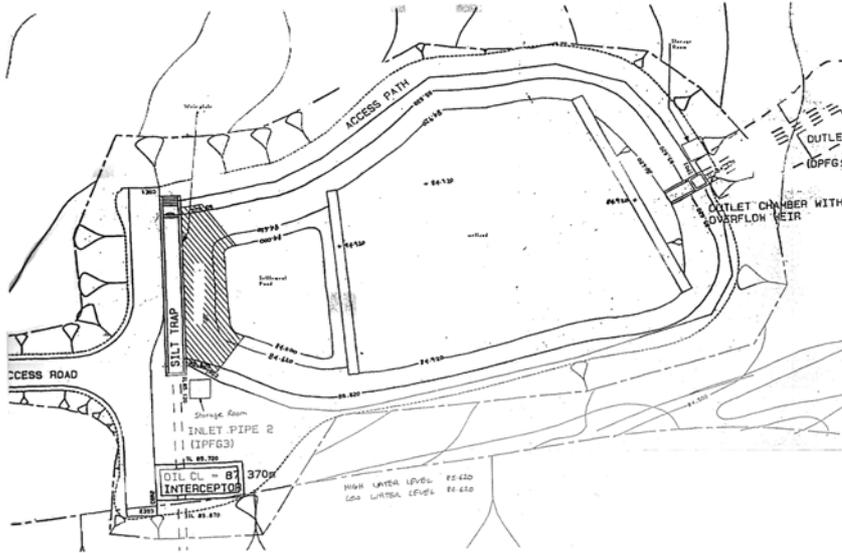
Design of Constructed Wetland Pond F/G adjacent to A34 Newbury Bypass
